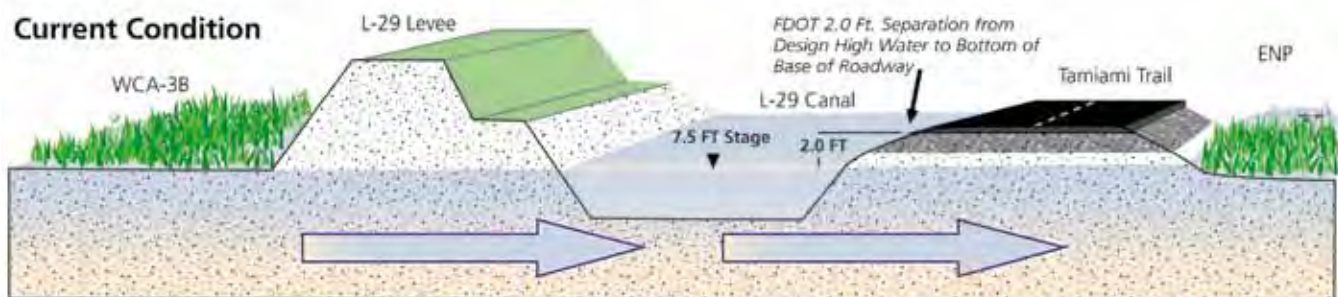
Current configuration of Water Conservation Area (WCA) 3B, L-29 Levee, L-29 Canal, existing Tamiami Trail, and Northeast Shark River Slough. Water levels in the L-29 Canal are maintained at 7.5 ft NGVD to prevent damage to the sub-base of the road, precluding the ability to transfer substantial volumes of surface water to Northeast Shark River Slough through a series of culverts (not depicted) to the south side where marsh ground surface elevations are only slightly lower than canal stage (see also Fig 7.).
